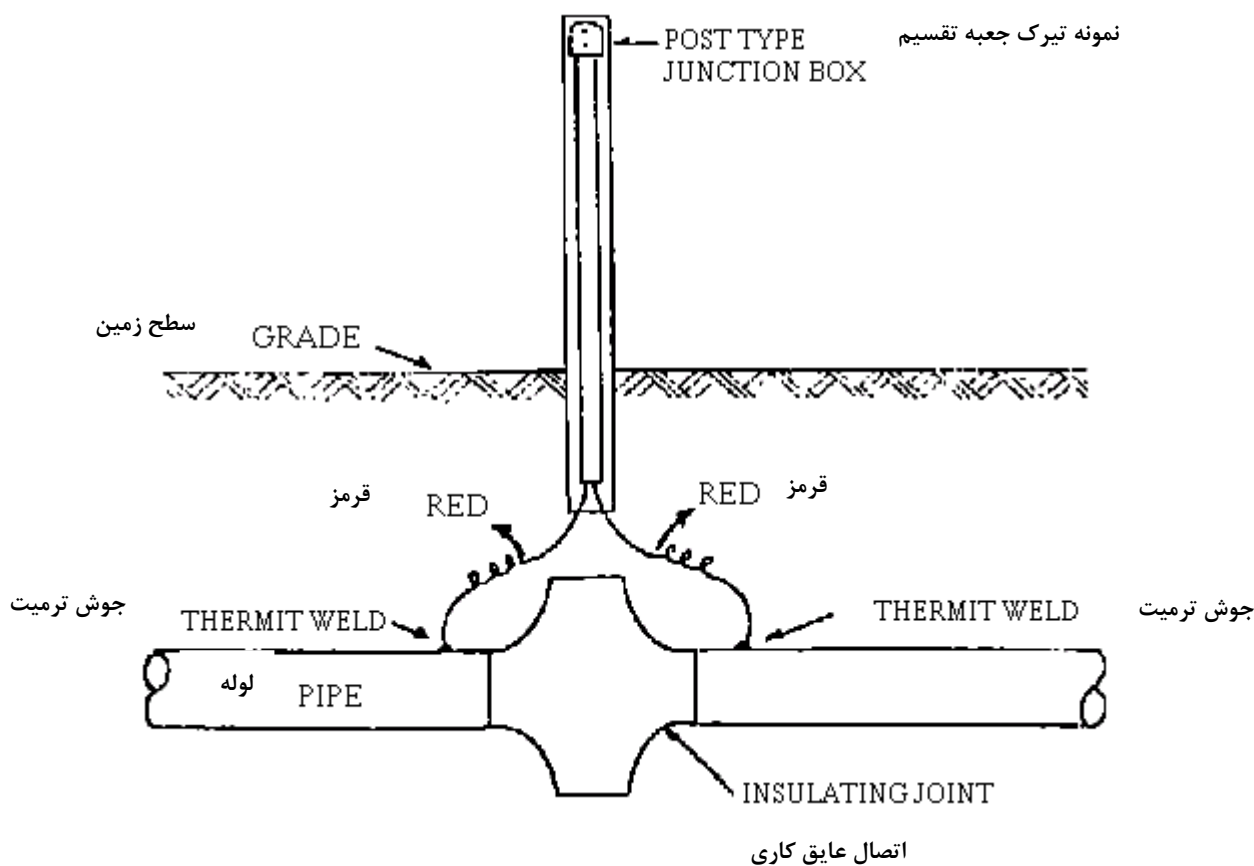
TYPICAL INSULATING JOINT TEST STATION
